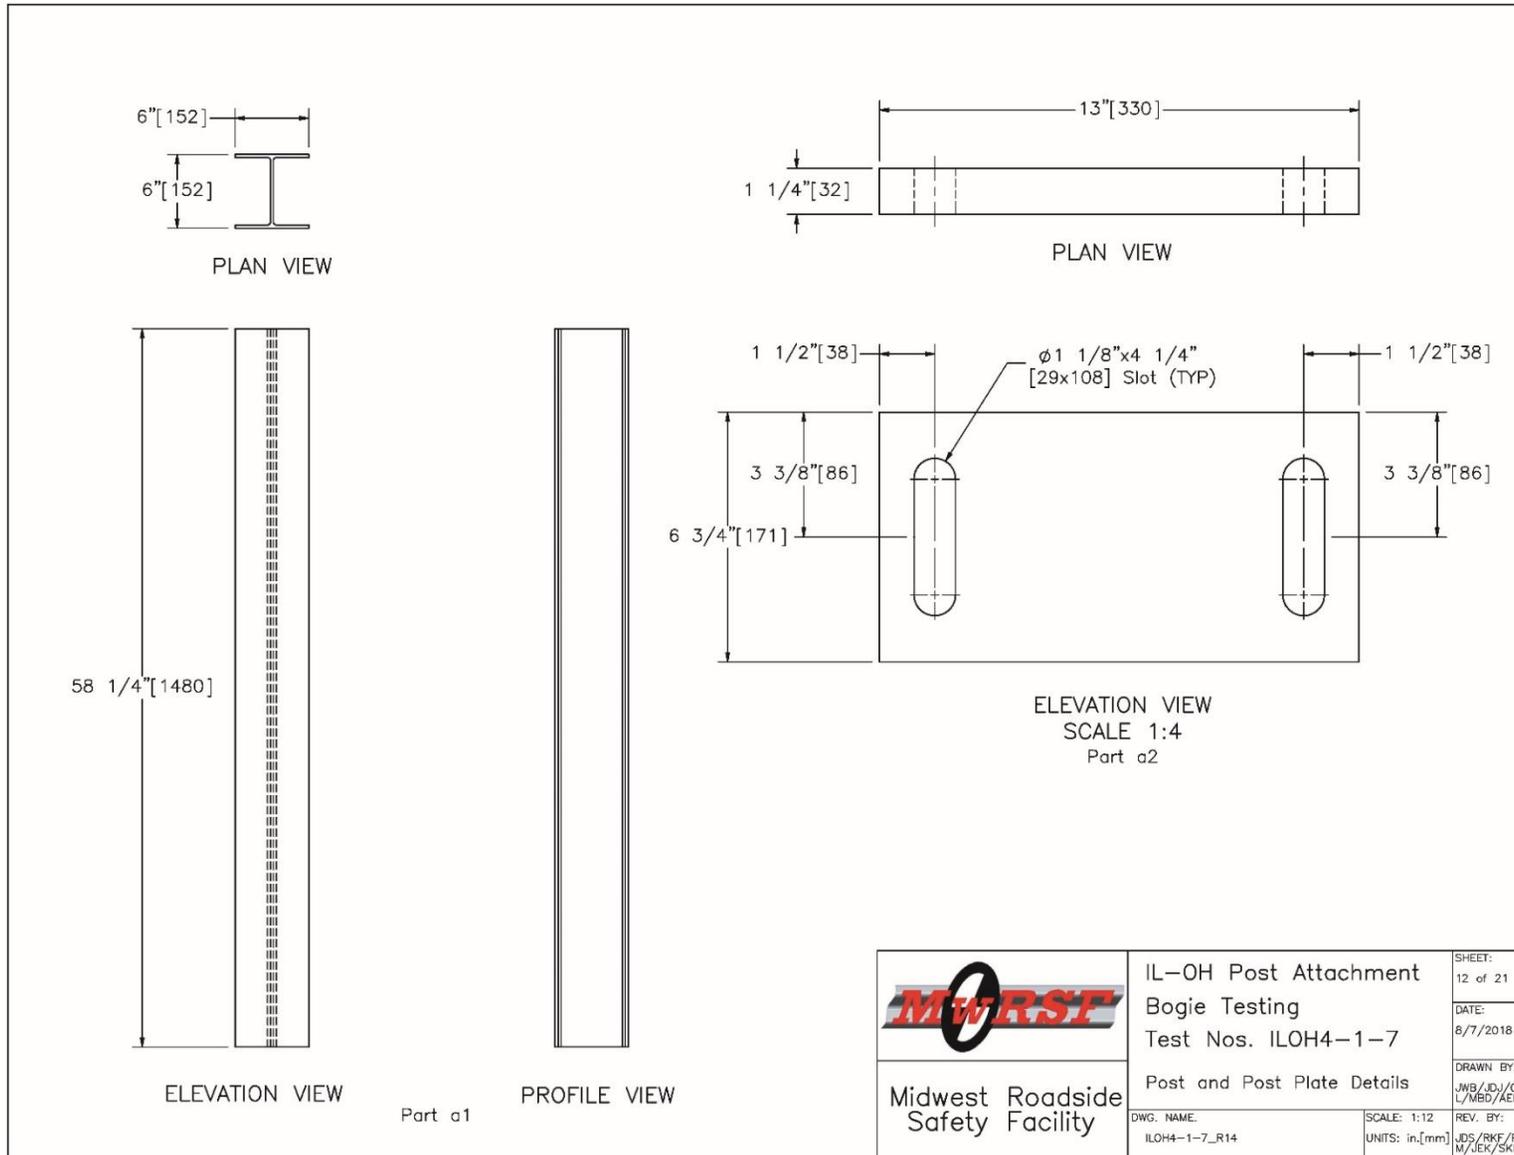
Post and 1 1/4-in. (32-mm) Post Plate Details
